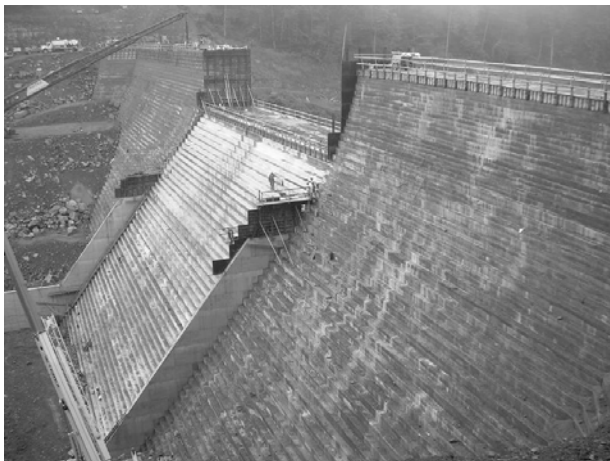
Stepped spillway on Elkwater Fork Dam (US, Reichler Engineering)
